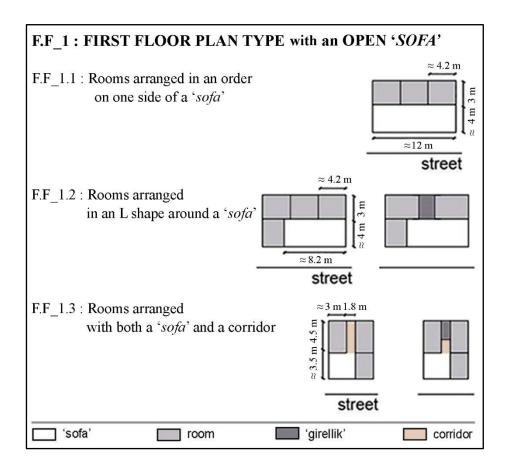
The First Floor Plan Type 1 (F.F_1) of the Traditional Ağlasun Houses.
